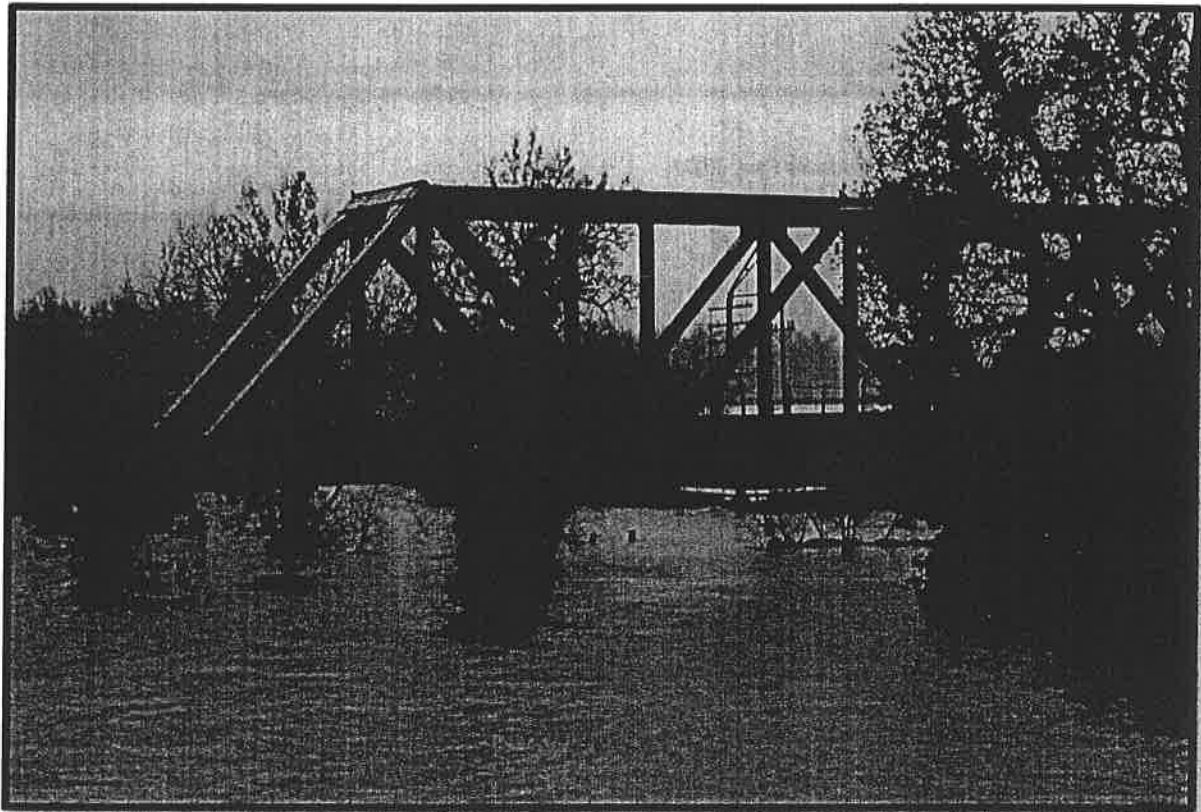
Eroded BNSF railroad embankment during the flood of 2011 (Fitzgerald, 2011)
